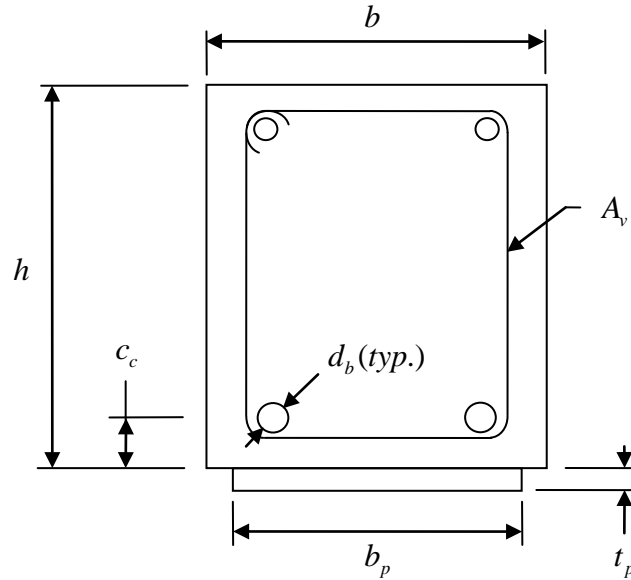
Typical Specimen Cross-Section used by Oehlers and Moran (1990)
